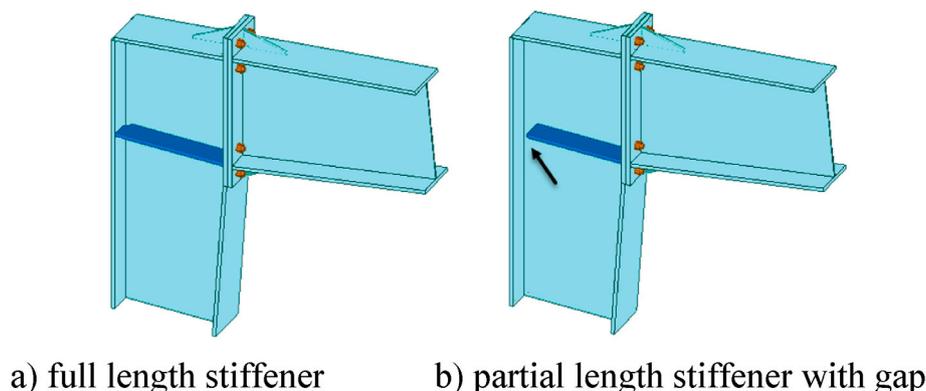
Typical knee joint with bolted connection and horizontal web stiffener.
